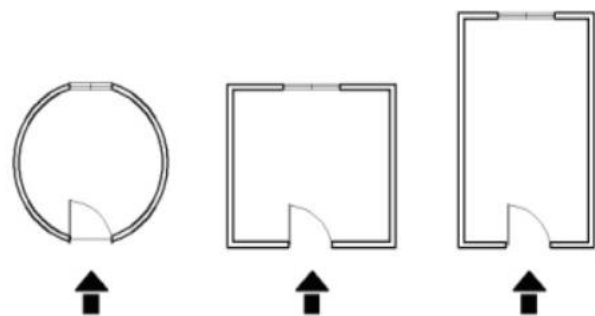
Placement of Openings in the Buildings, creating a flow path for water
